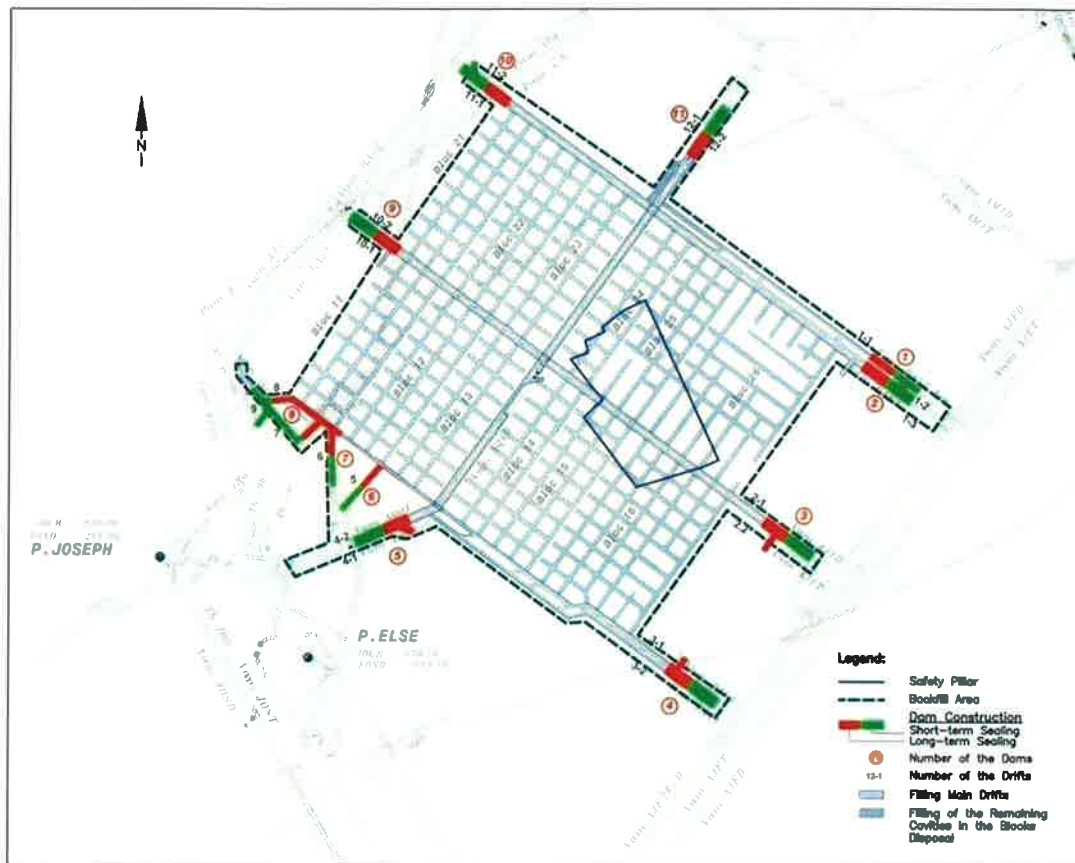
Overview of the Location of the Planned Dams as well as the Main Drifts and Voids to be Backfilled in the Storage Blocks
